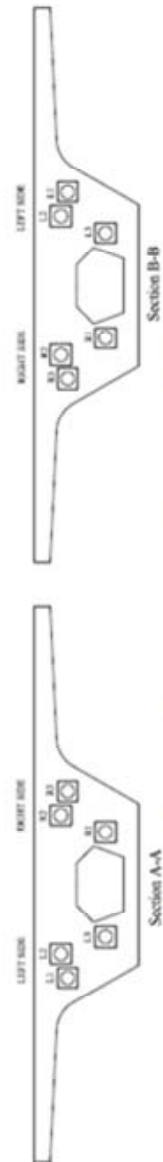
Typical Numbering System for Tendons of a PT Girder.
